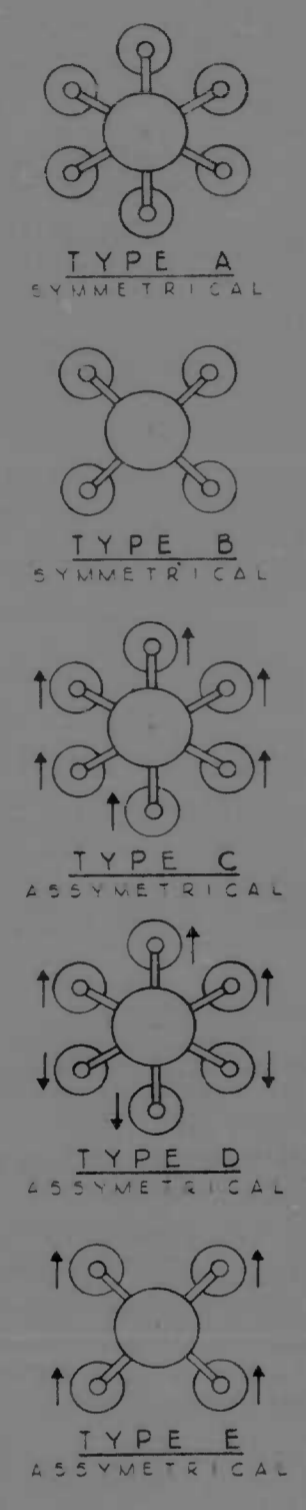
DETAILS - TYPE III AND IV INSTALLATIONS SHOWING LIGHTING STANDARD MODIFICATION D NOT TO SCALE
